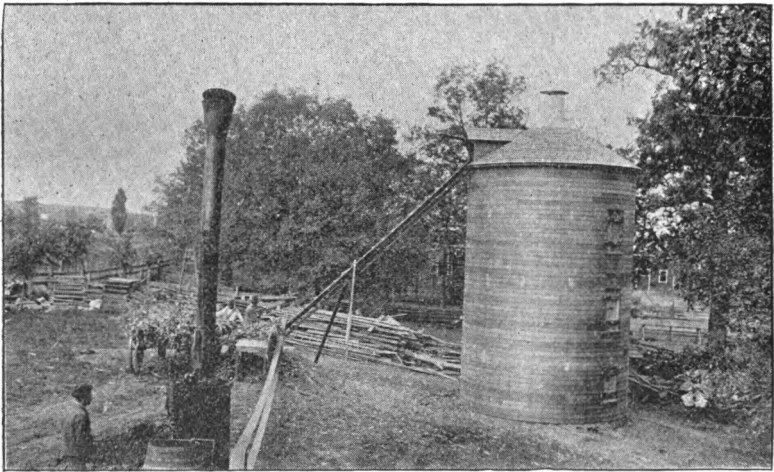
Showing an 80-ton silo, 16 feet outside diameter and 27 feet deep.
